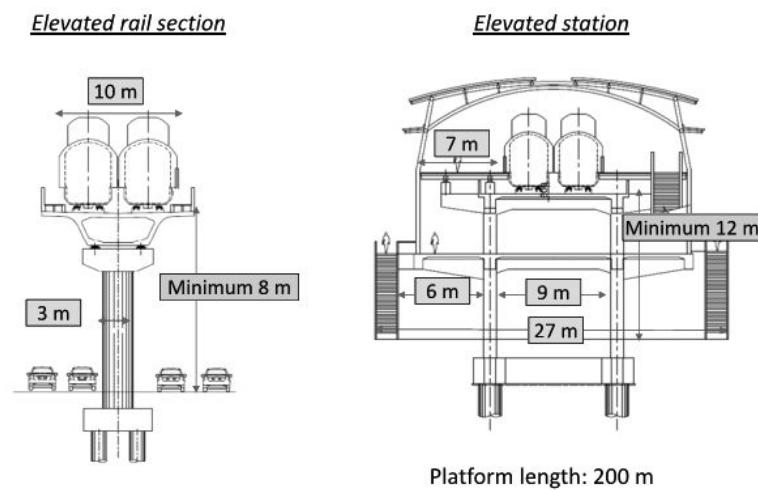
Preliminary cross-sections for elevated railway structures.
